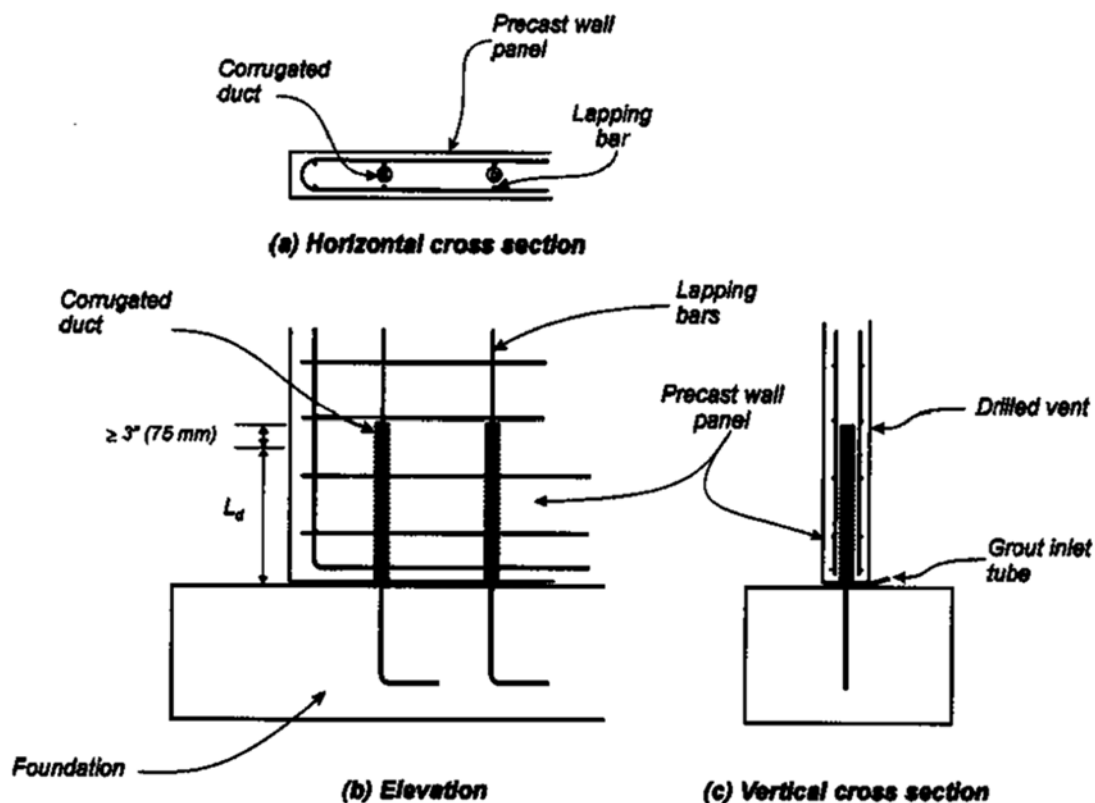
Lightly reinforced wall panel to foundation connection detail proposed by (Crisafulli *et al.*, 2002)
